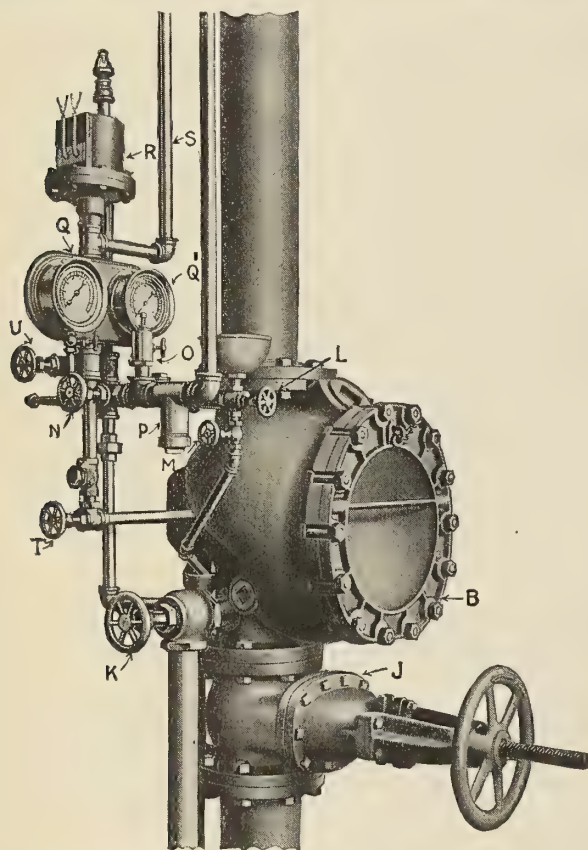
Dry Pipe Valve in Place in Sprinkler System
